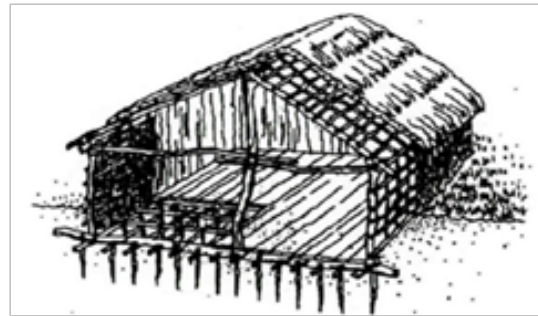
Architectural modeling of residential buildings in dry railing of Chengdu 12th bridge
